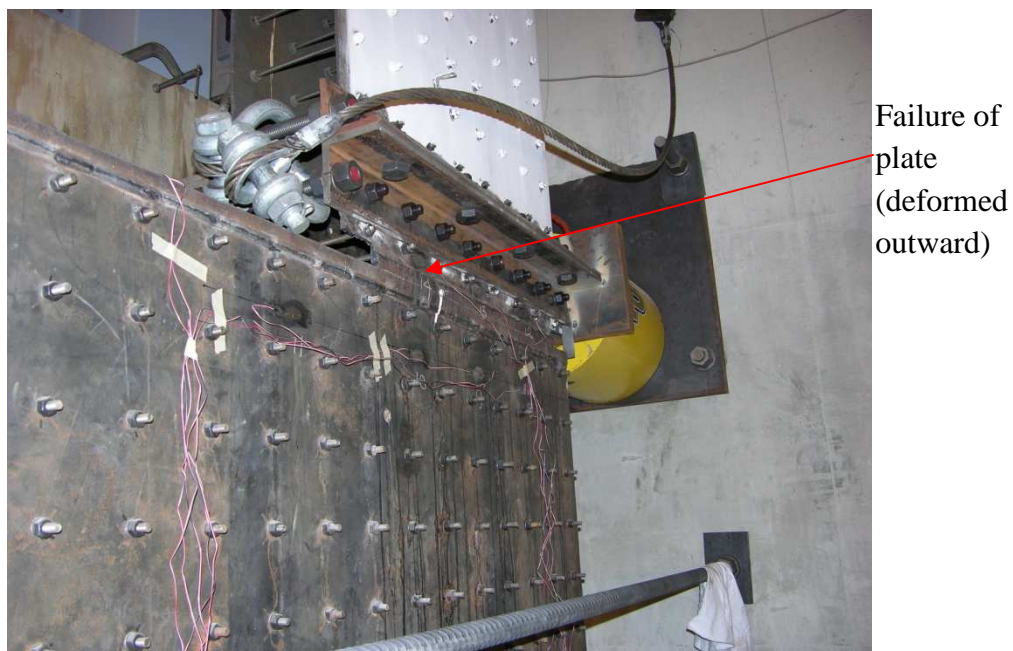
Failure of the Horizontal Connection - Test-2: View 1
